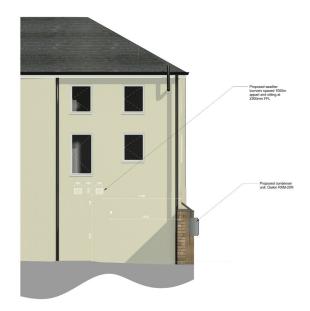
Proposed East Elevations – proposed new rear facing façade with weather louvers
